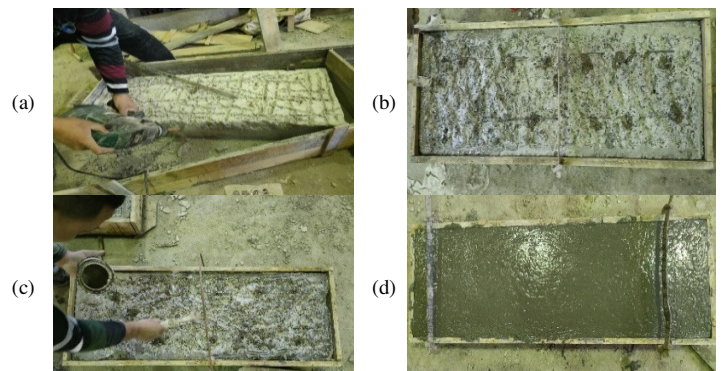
RC beam strengthening processes. (a) Roughing beam's surface, (b) installing shear connectors, (c) adding adhesive material, (d) casting UHPFRC mix.
